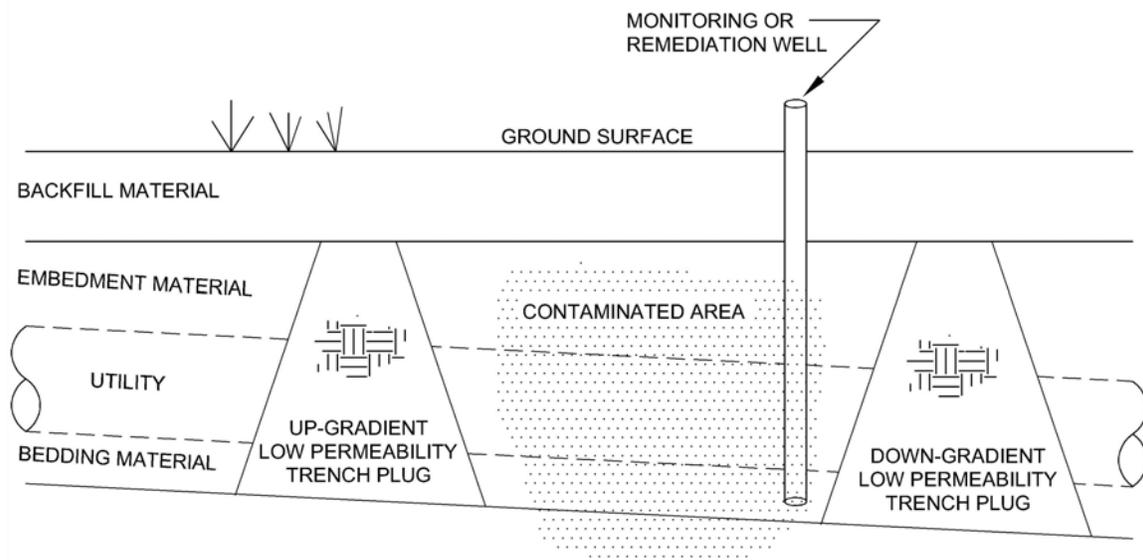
Typical Placement of Low Permeability Trench Plugs
